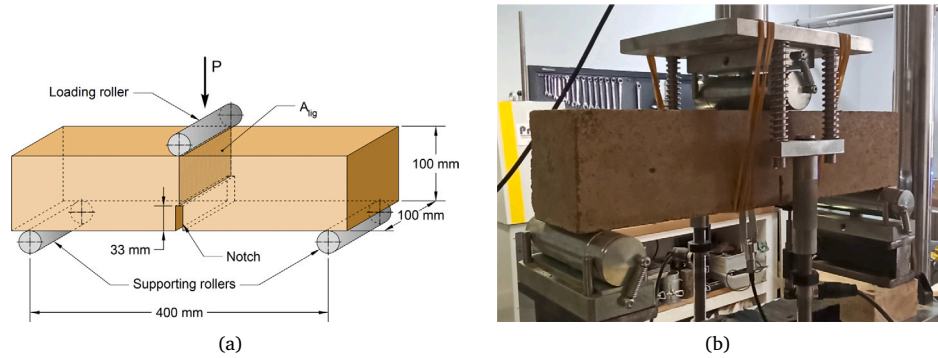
Three-point bending test: (a) setup scheme and dimensions, and (b) URE specimen during testing.
